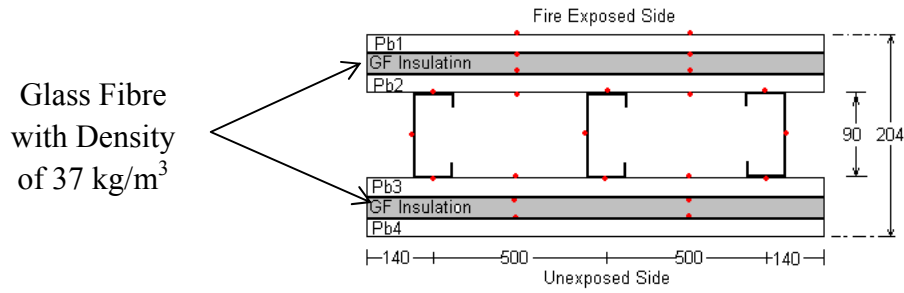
Schematic Diagram of LSF Wall Test Specimens [5]
